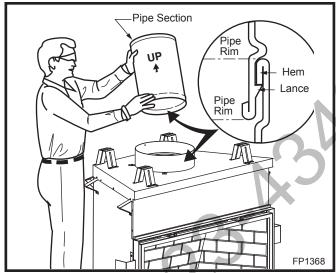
Install pipe, listening for the snap-lock to fasten.
